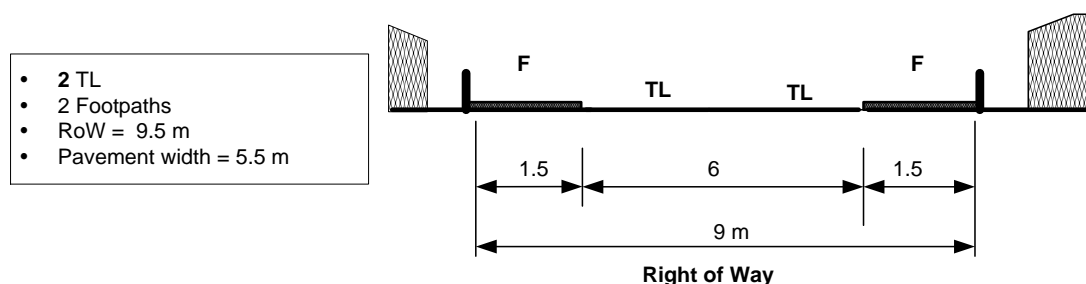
, Typical Cross-section for Class C Roads (RoW 9 m)
